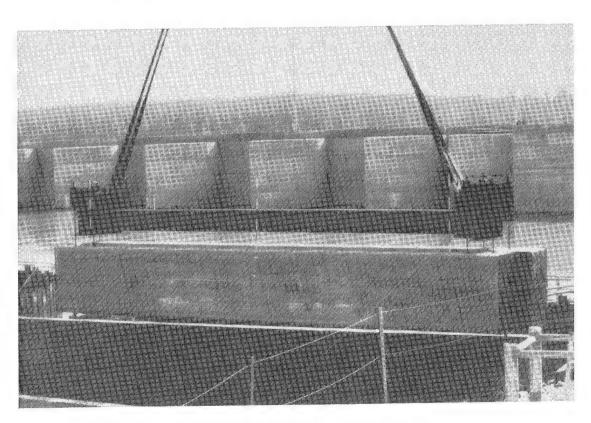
Offloading precast beams for Auxiliary Lock guidewall, Melvin Price Locks
